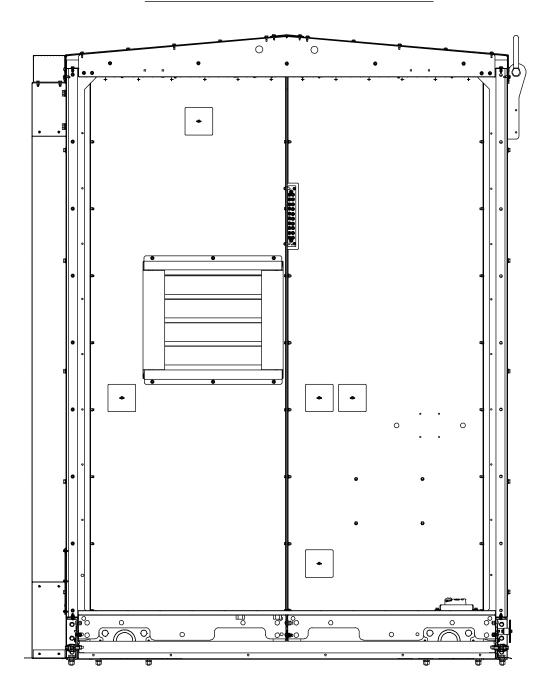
Wall Detail Views (cont'd from previous page, cont'd on next page)
